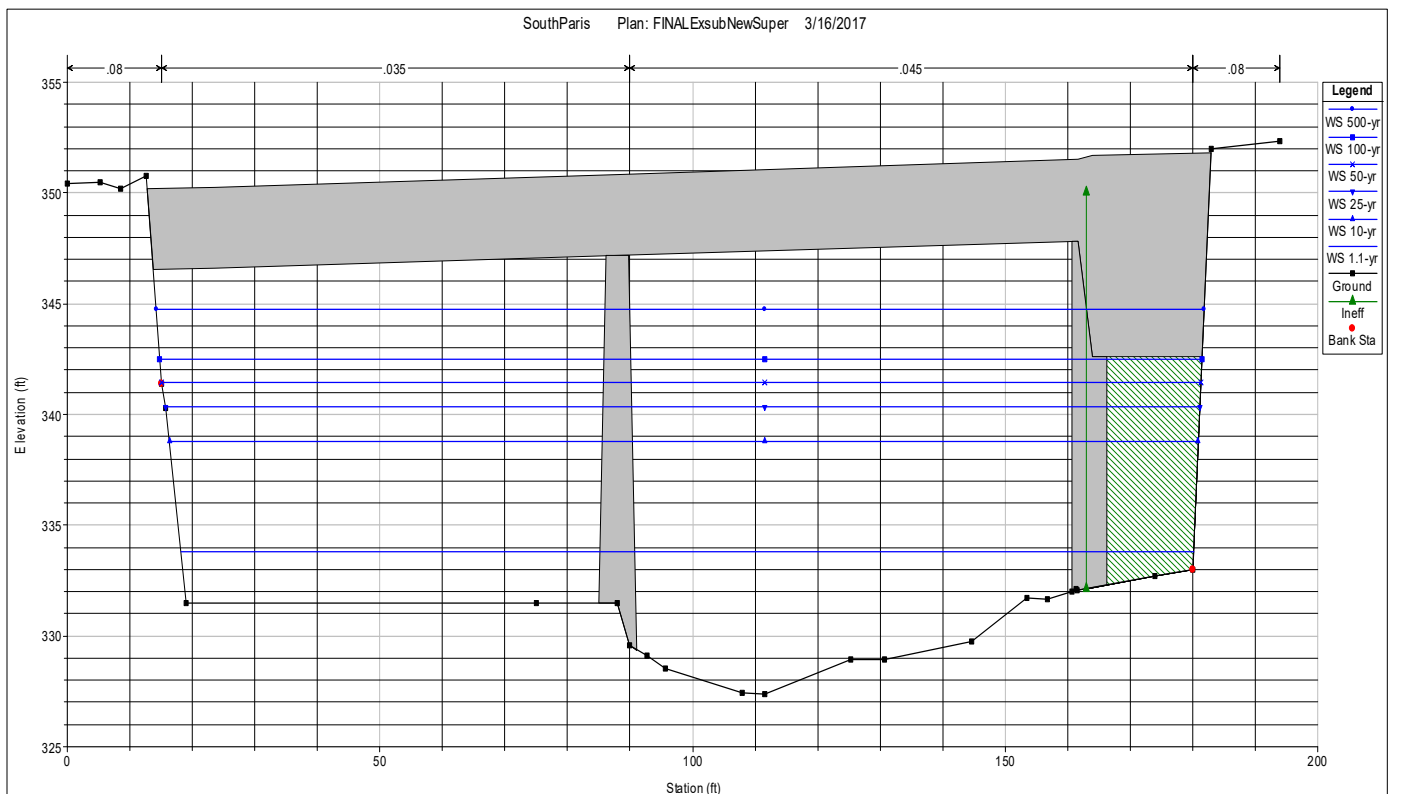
Proposed Bridge section maintaining existing substructures and removing excess rubble, upstream face, plotted facing downstream.
